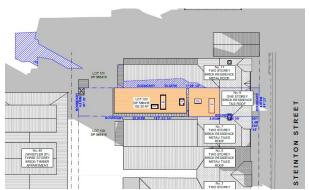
Shadow Diagram at 9am (21 June) depicting the extent of new shadows in blue.
